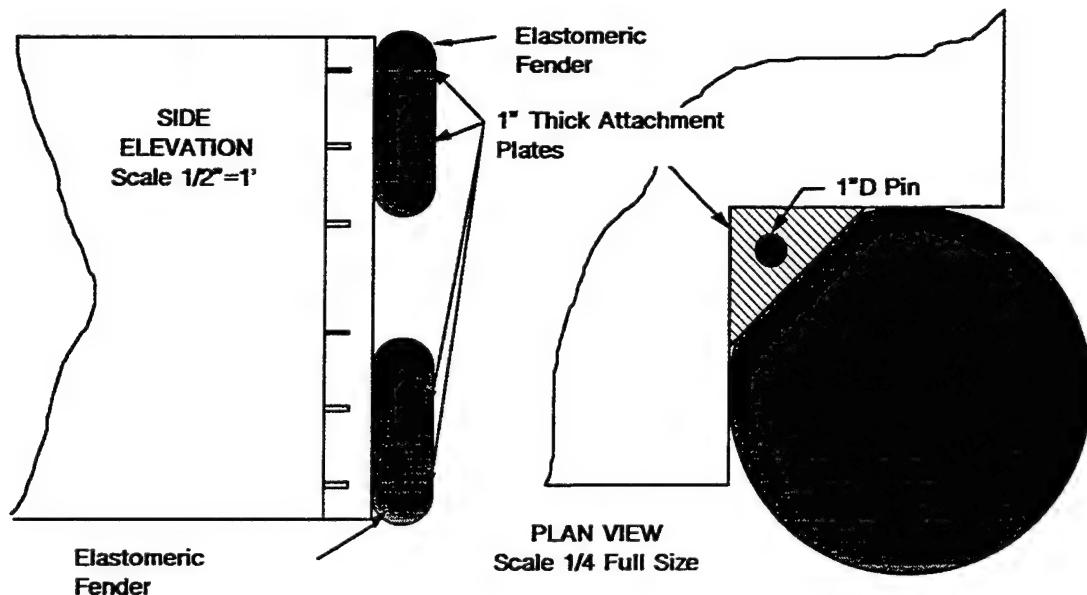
Tri-Module Fender Corner Fitting Replaces ISO Corner Fitting When Deployed
